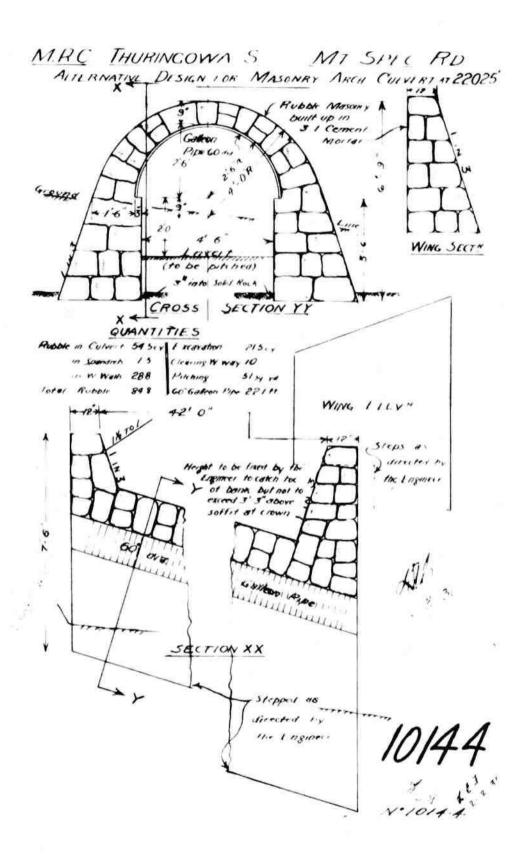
Original drawing no. 10144 of Culvert 188A at Fairy Falls. This was one of three different designs for masonry arch culverts on the road.
